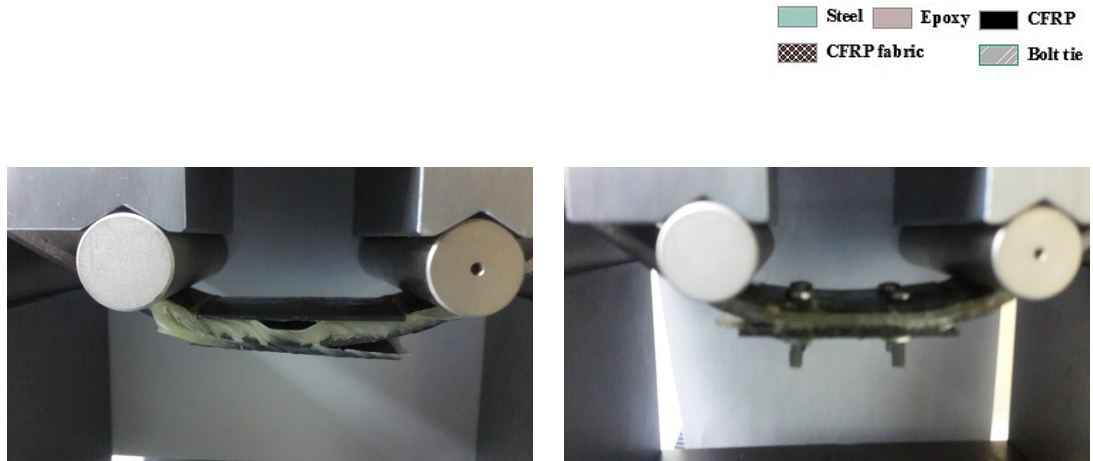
CFRP retrofitted steel plates under four-point bending test.
